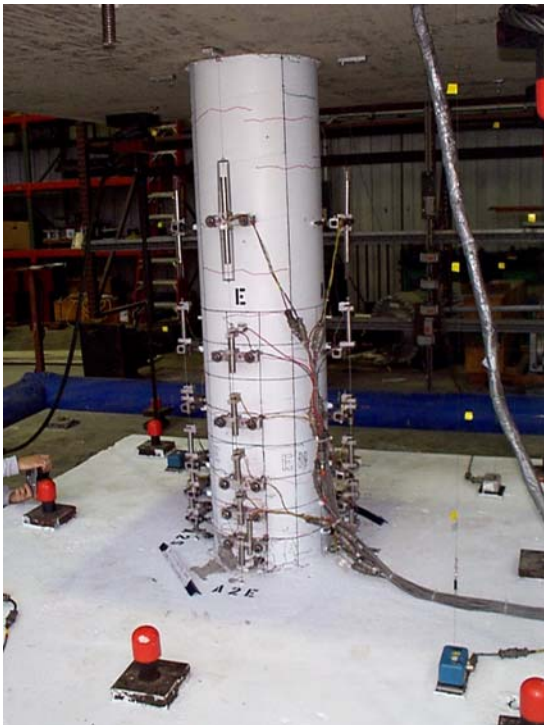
Specimen A1 after Run 8. Another view of the west face with the fracture bar (#9).
